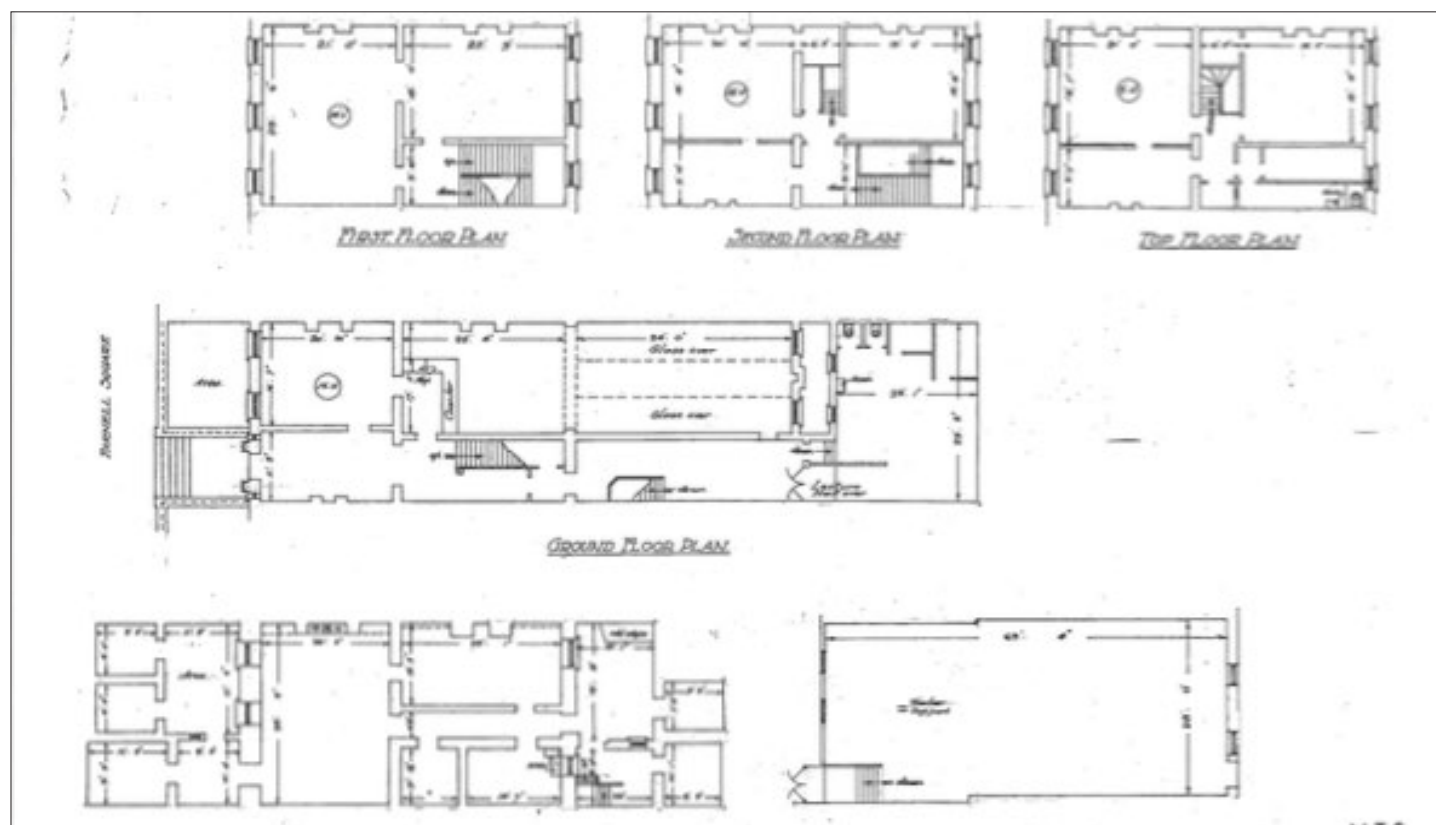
No 25: Plan form substantially intact. Entrance door and steps still in place. Building remains independent and unconnected to either side. Counter in rear ground floor room. Large opening in rear facade at ground level opening into large extension with glass roof over.
